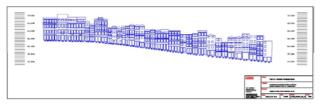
Architectural document of street facade survey of Bairro da Sé, Porto, Portugal.
